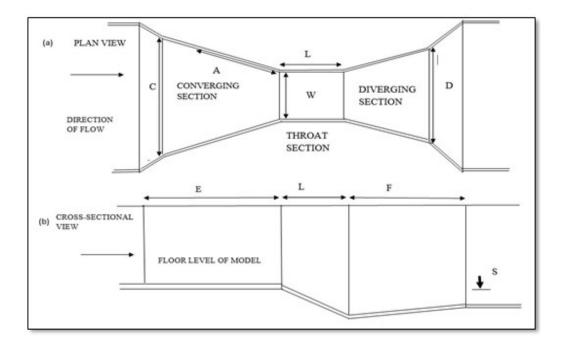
General Layout of Parshall Flume (A) Plan View, (B) Cross-Section View
